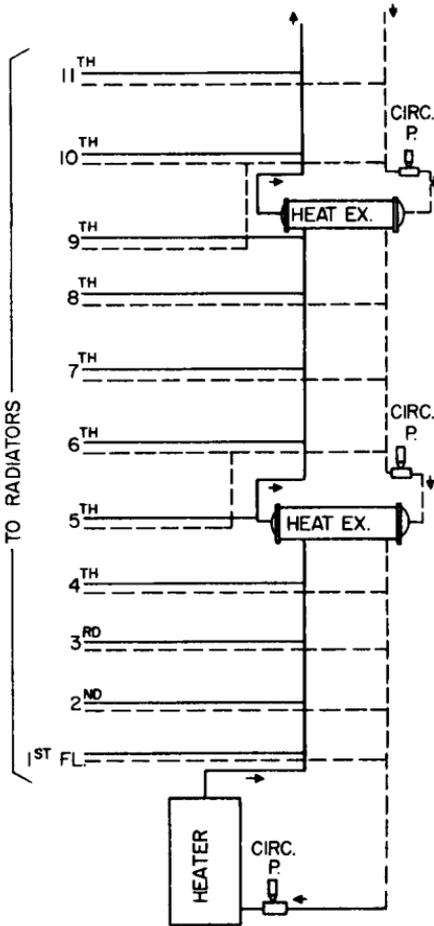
Piping layout for tall building, including heat exchangers.
